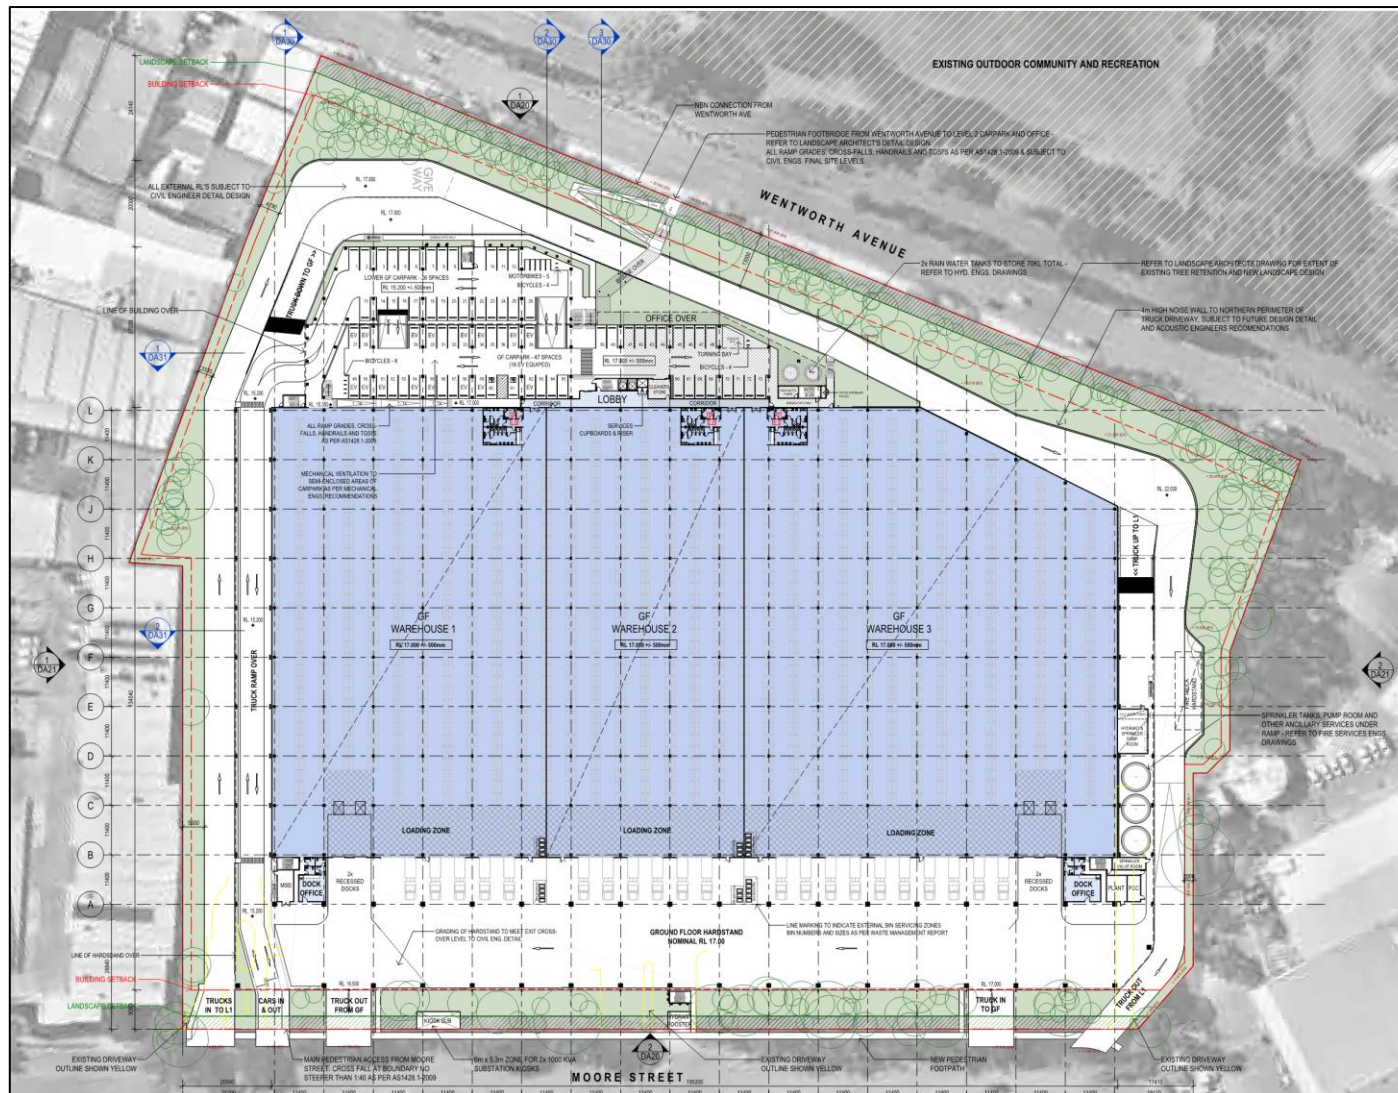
Ground Floor Plan (Nettletontribe Architects, 2024)
